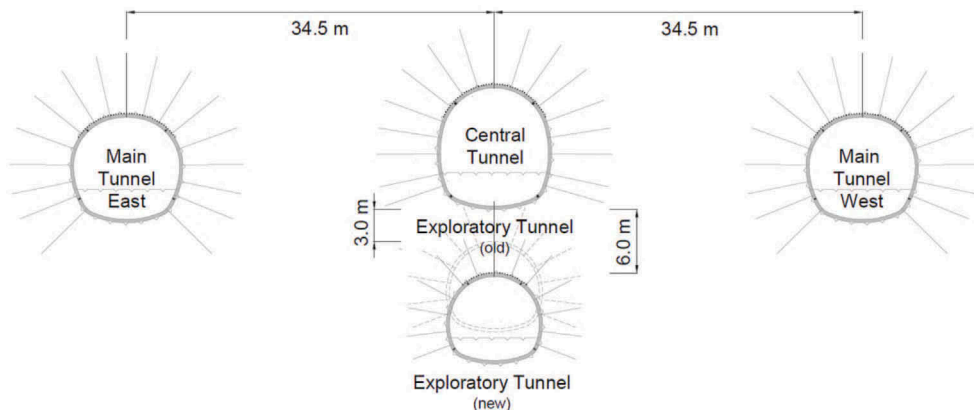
Cross-section through the St. Jodok emergency stop – Lowering of the exploratory tunnel.
